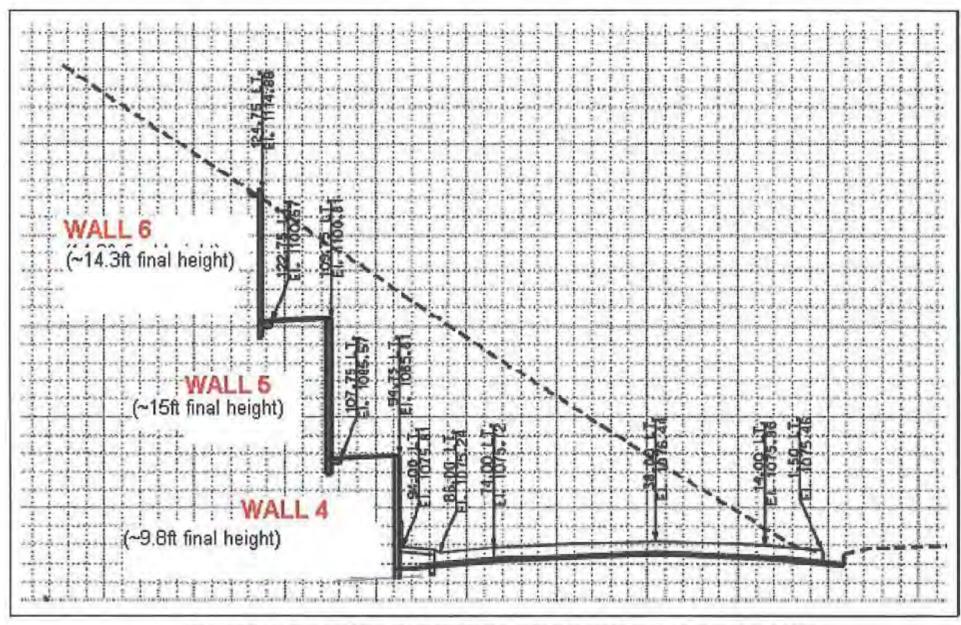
Cross Section of Three Tier Soil Nail Wall at Station 1424+00
